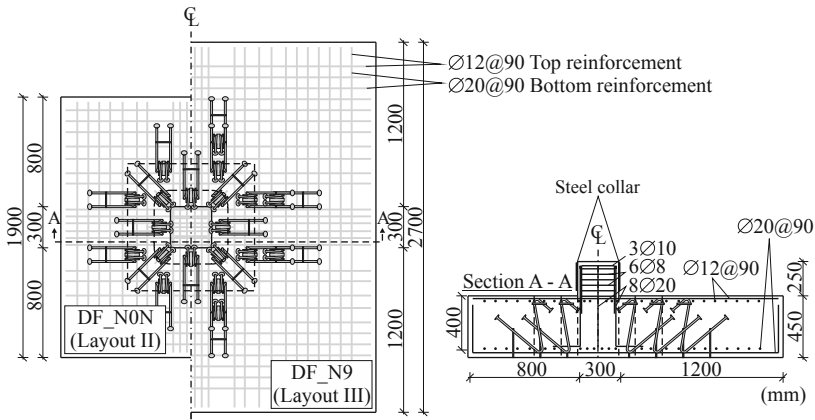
Layout of flexural reinforcement and punching shear reinforcement for specimens DF\_N0 N (Layout II) and DF\_N9 (Layout III)
